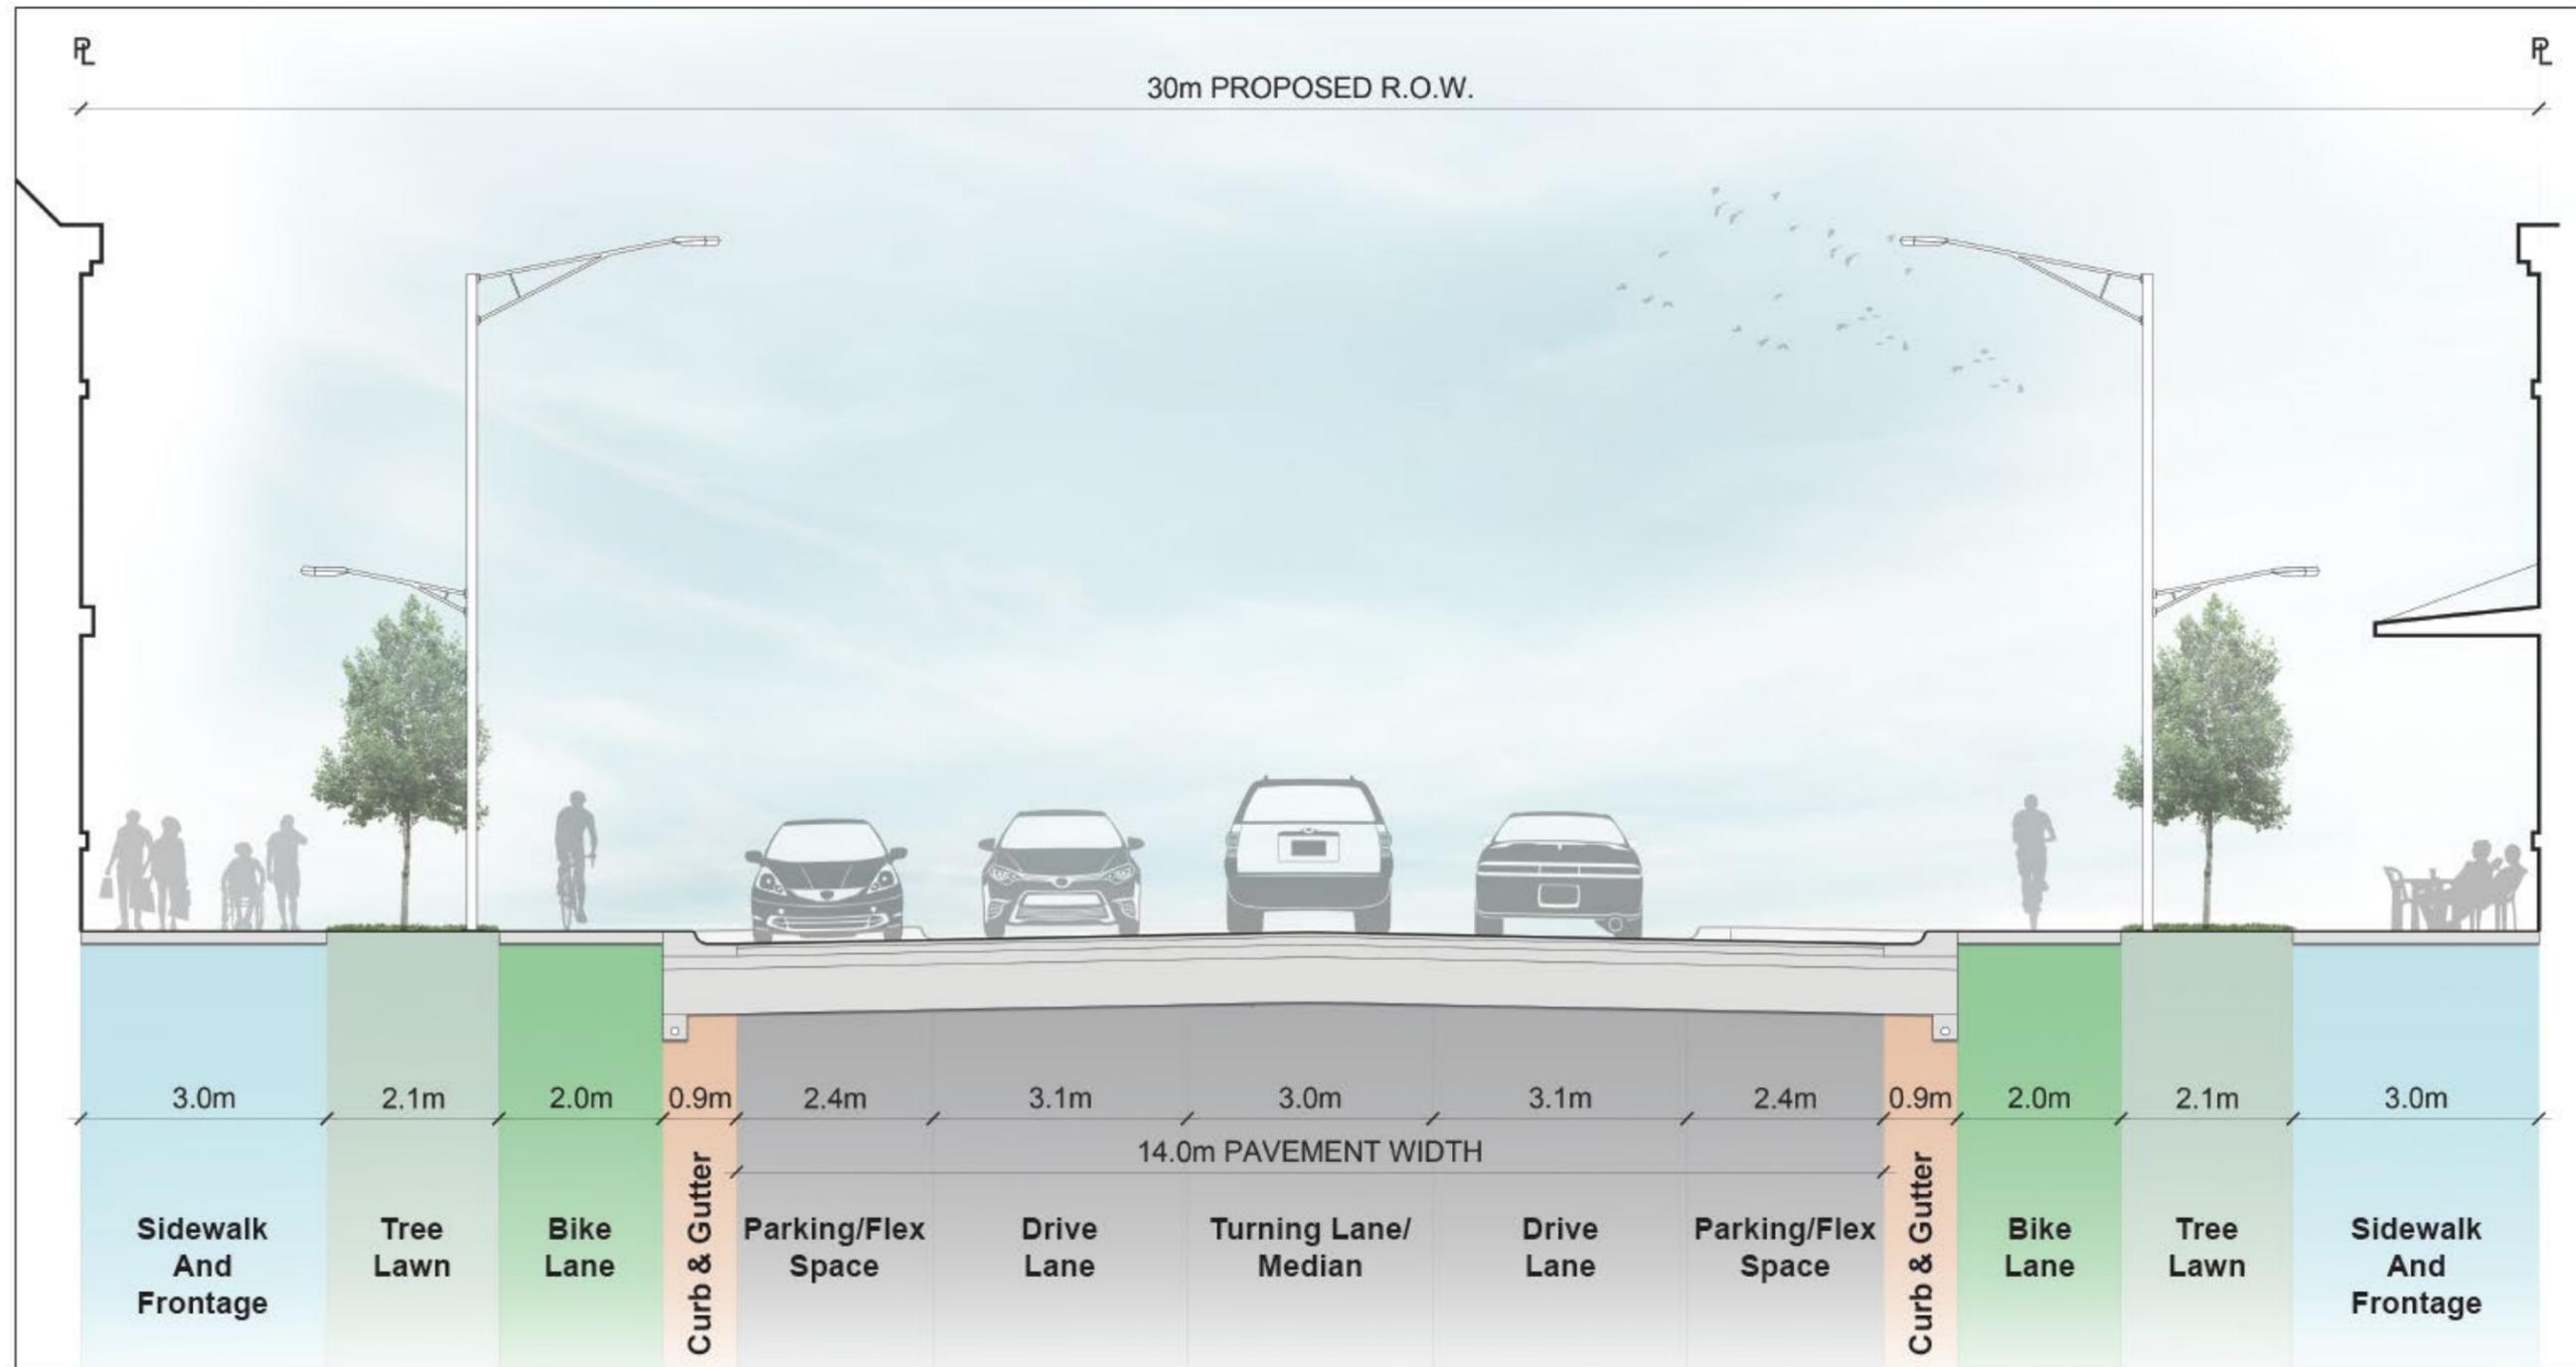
Downtown Commercial Street – Conceptual Application A (Retrofit)
